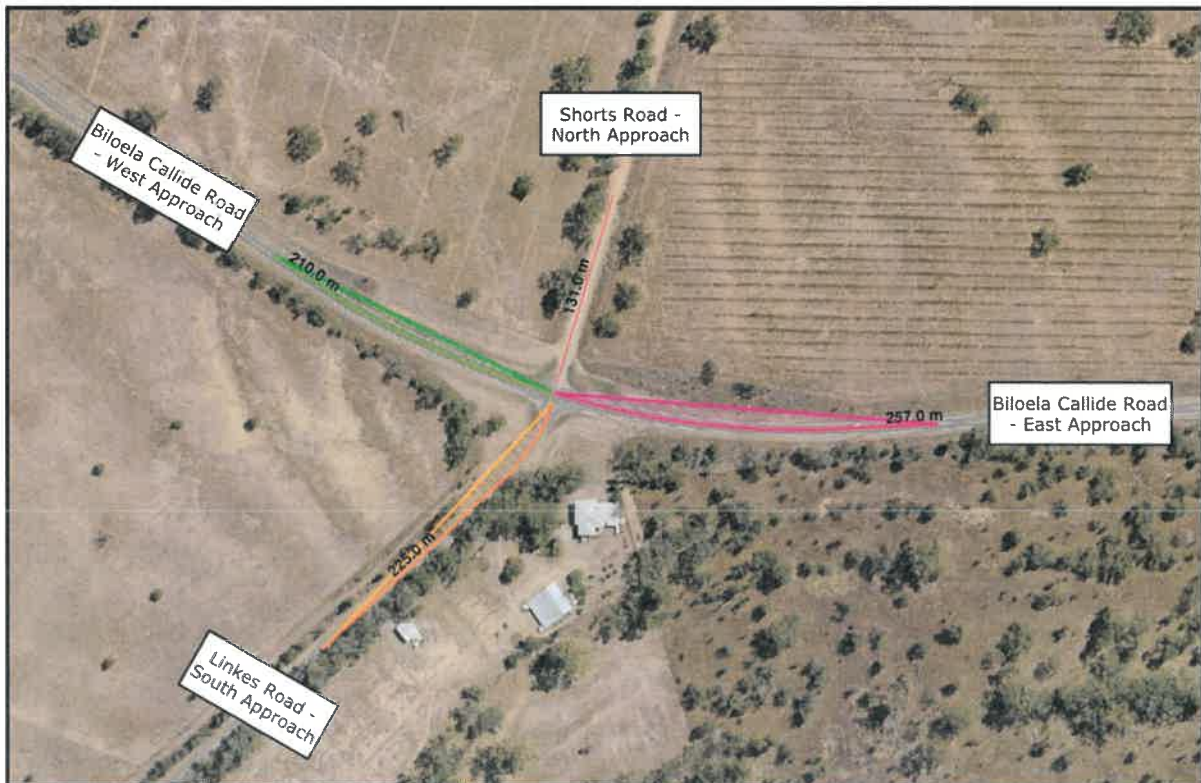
Biloela Callide Road / Shorts Road / Linkes Road intersection – minimum stopping sight distances
